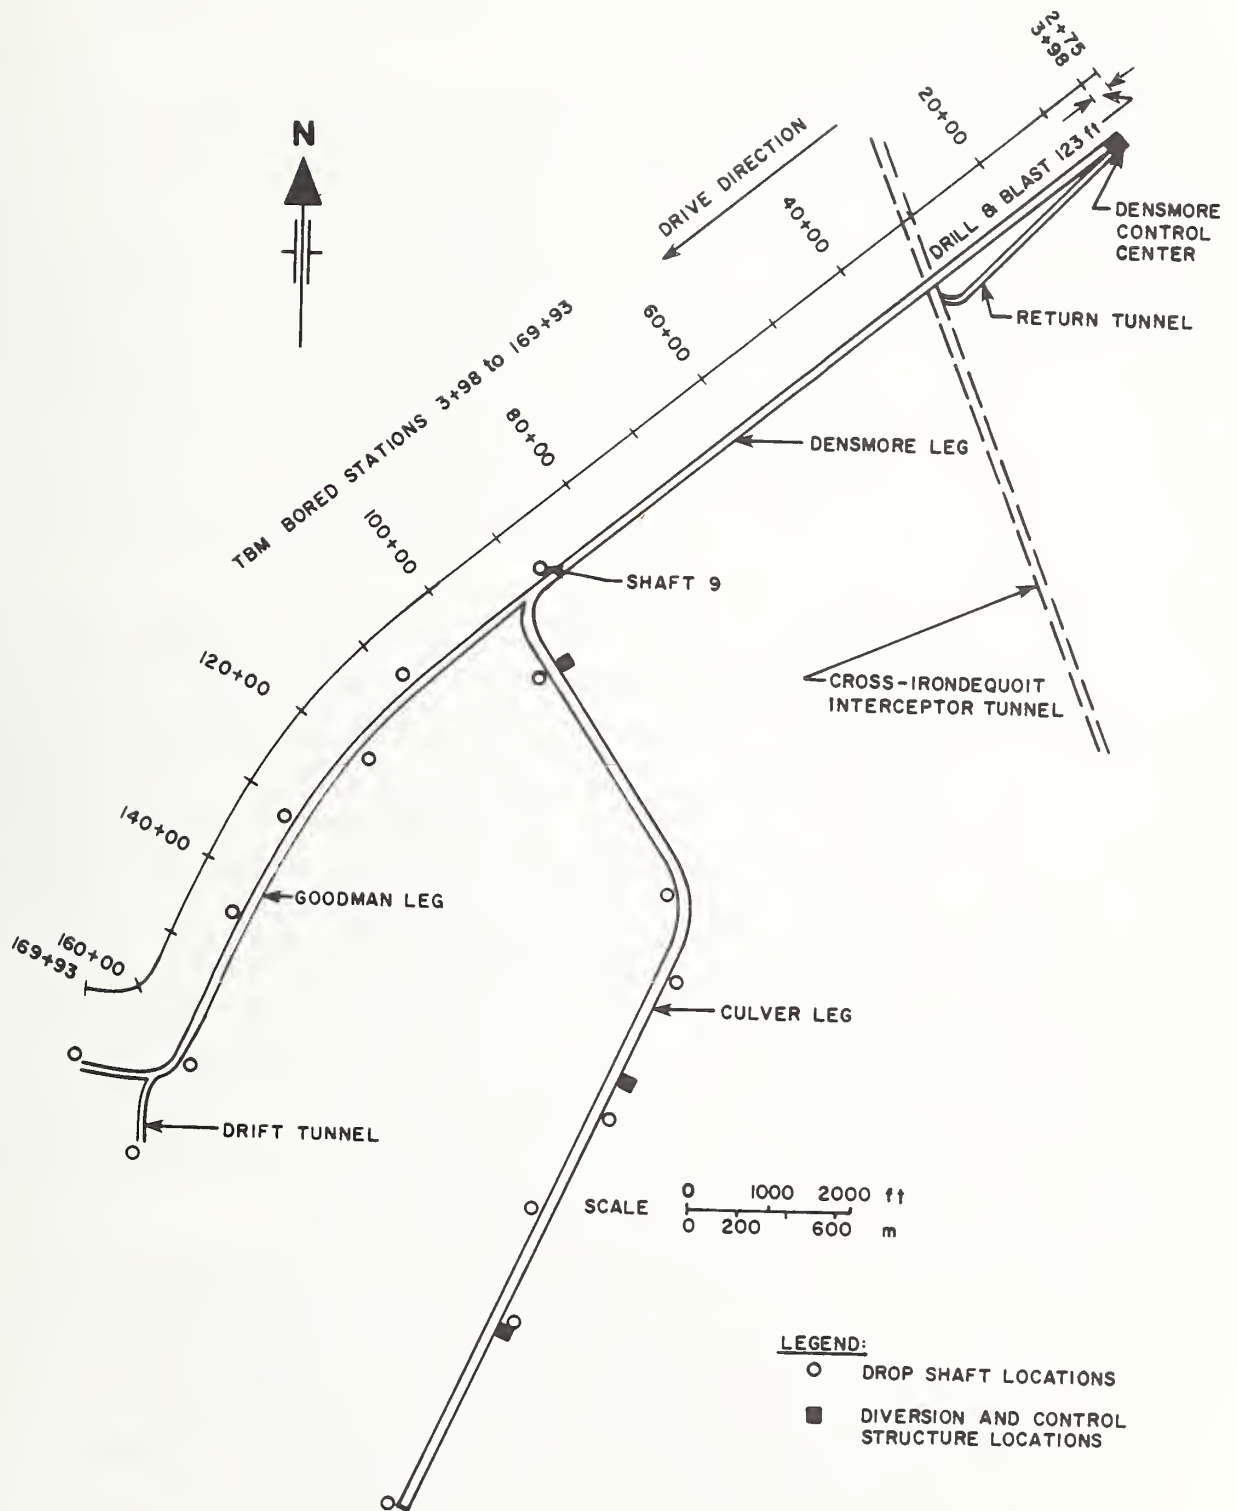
PLAN VIEW OF THE CULVER-GOODMAN TUNNEL
